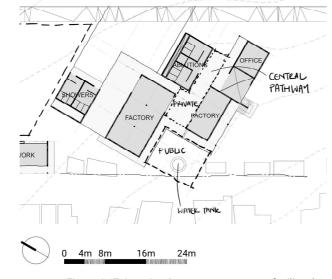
Iteration 3 waste management facility plan (Author 2021)
